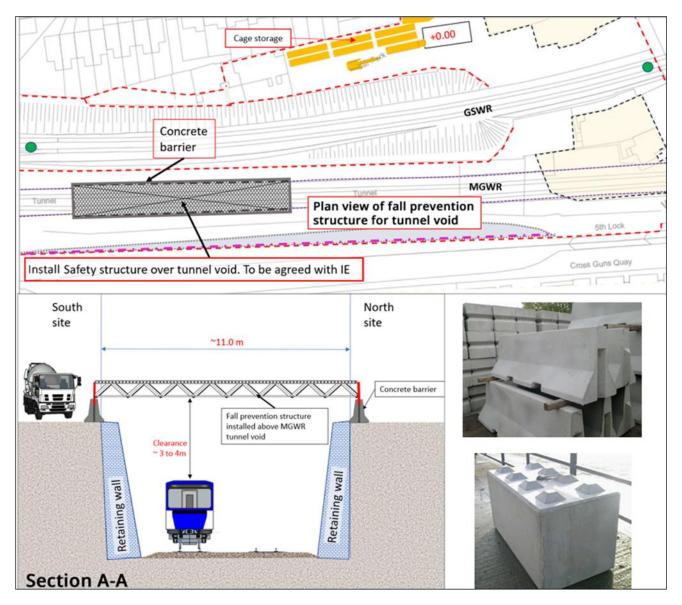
Plan view and cross section through enclosure over MGWR tunnel opening
